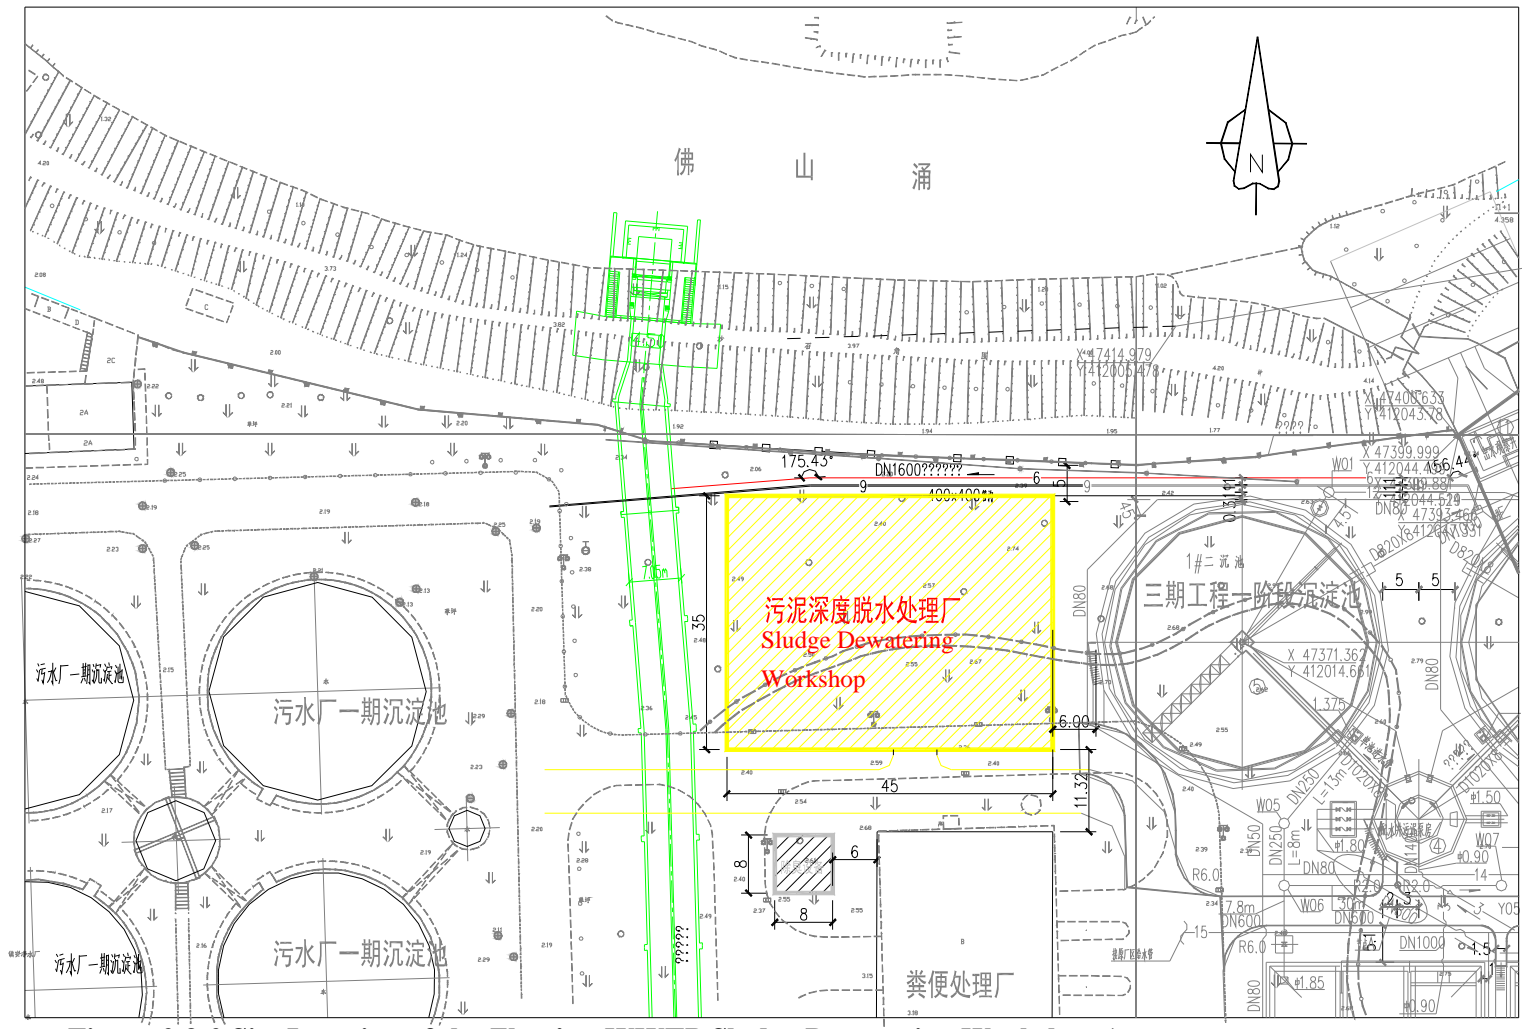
Site Location of the Zhen'an WWTP Sludge Dewatering Workshop (Scale 1:960)
